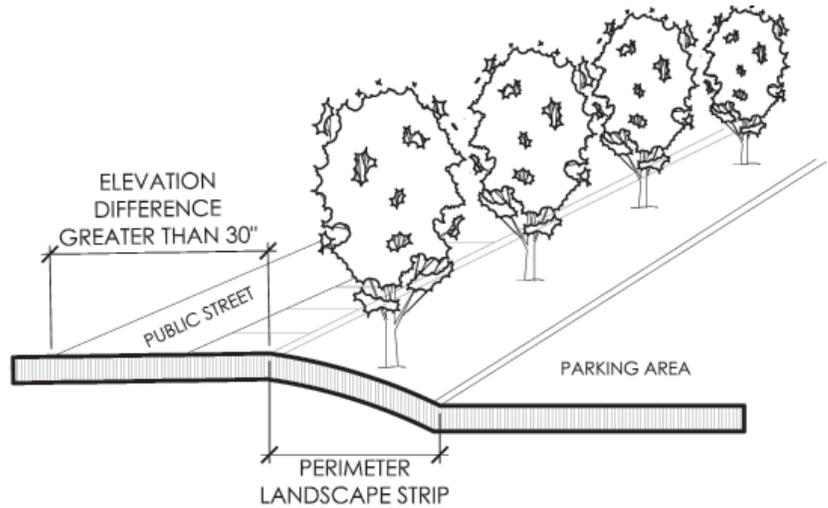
(Drawing depicts 100' of parking perimeter)
